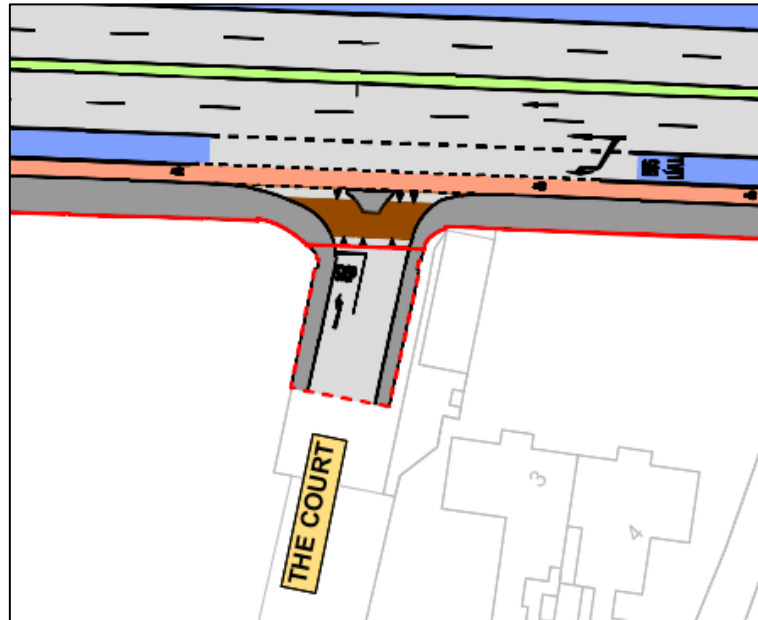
Extract from General Arrangement Drawing (Sheet 09)
